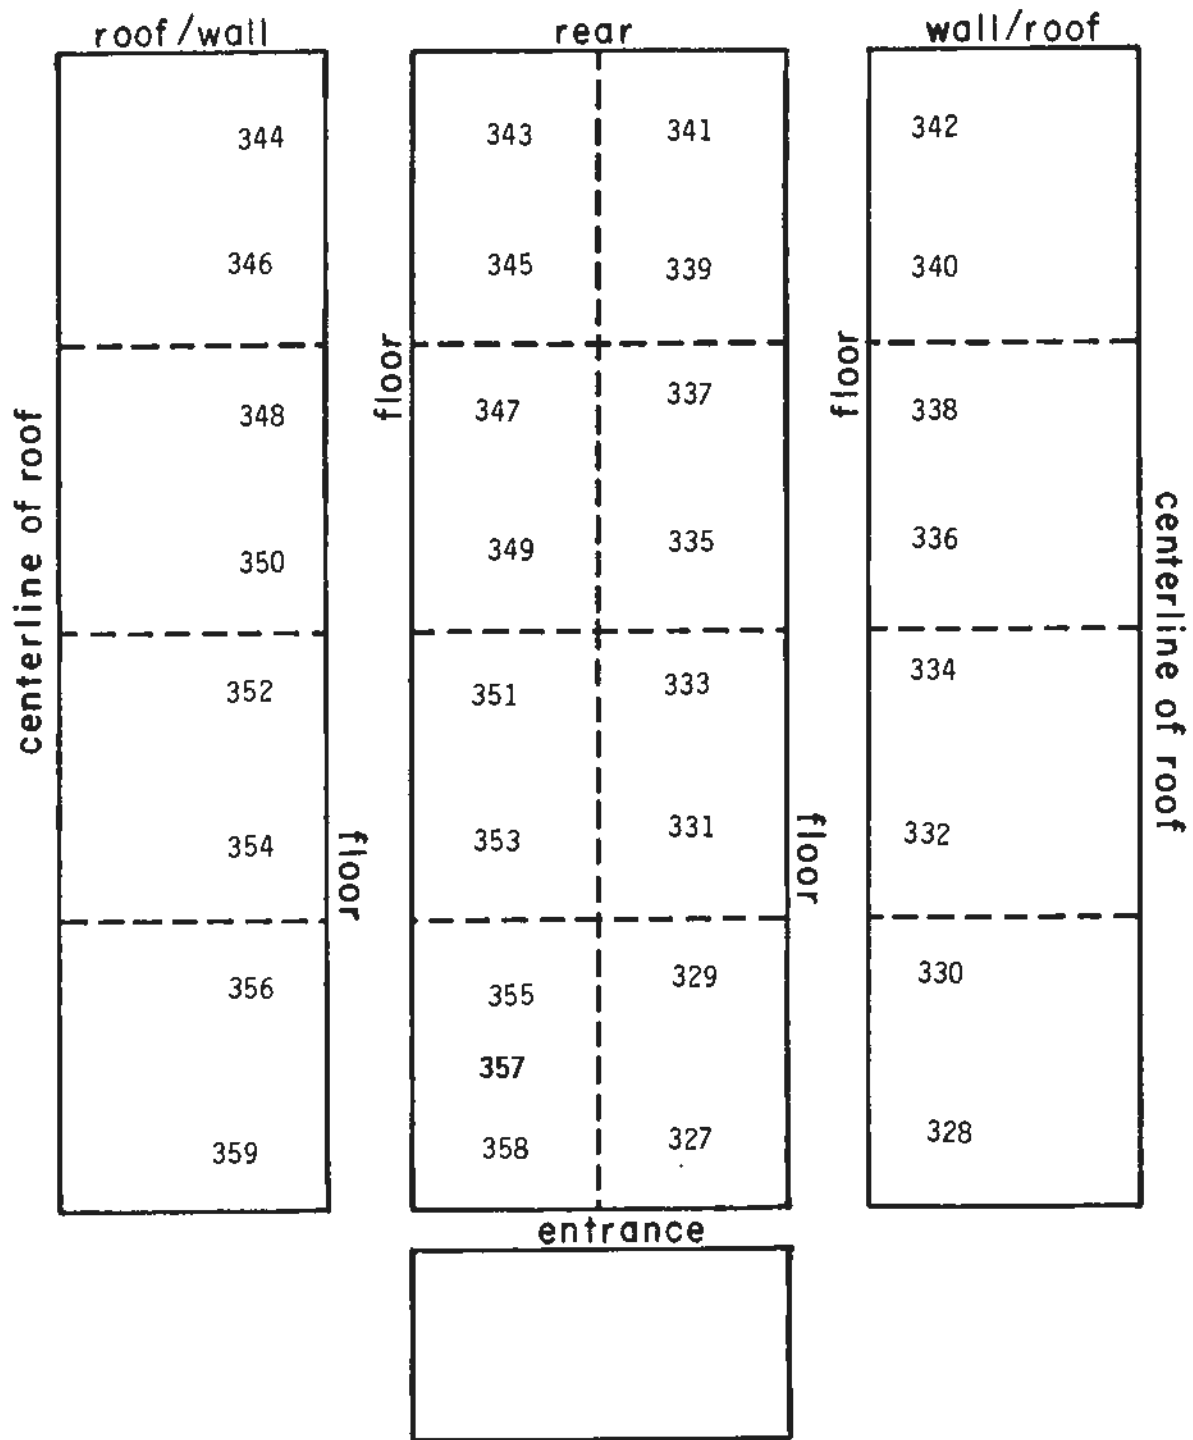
Second Team Surveyed Positions: Building 811 (Interior)
